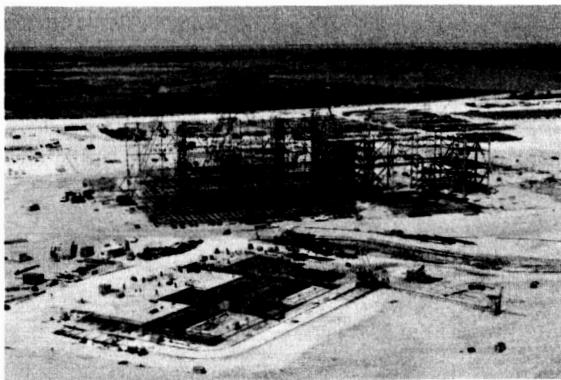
Construction of Vertical Assembly Building showing structural steel in place.
